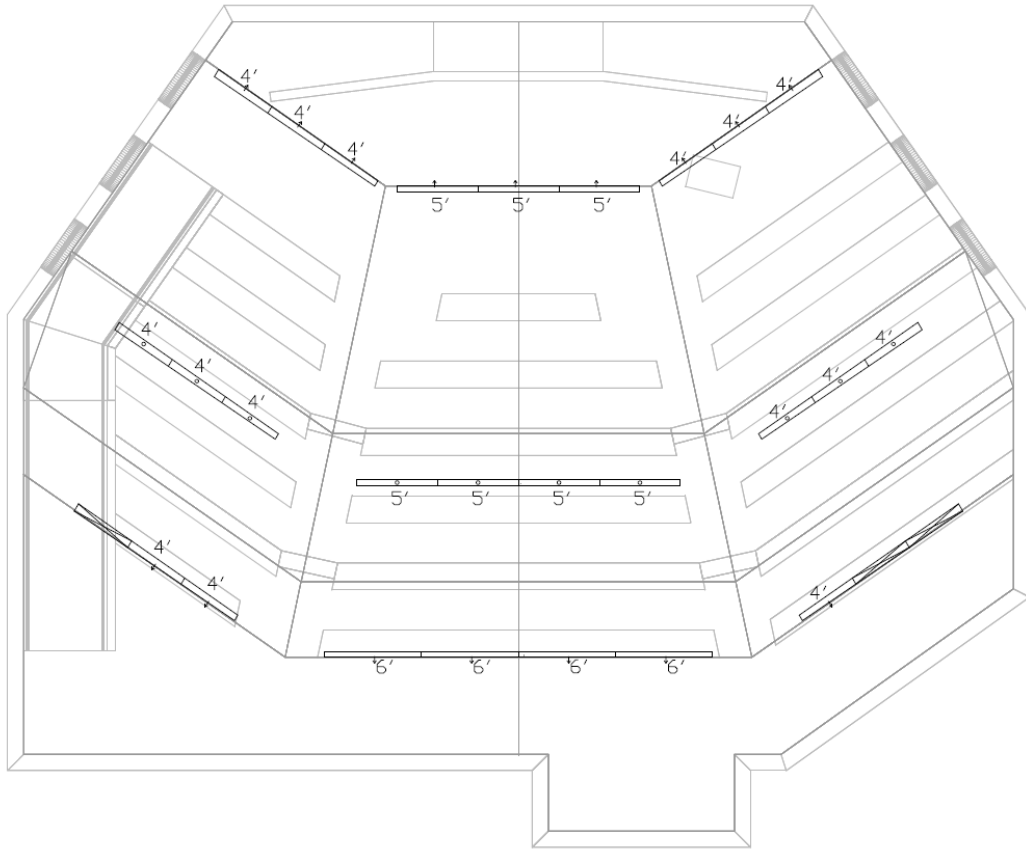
Lecture Hall Reflected Ceiling Plan – Diffusers Only
